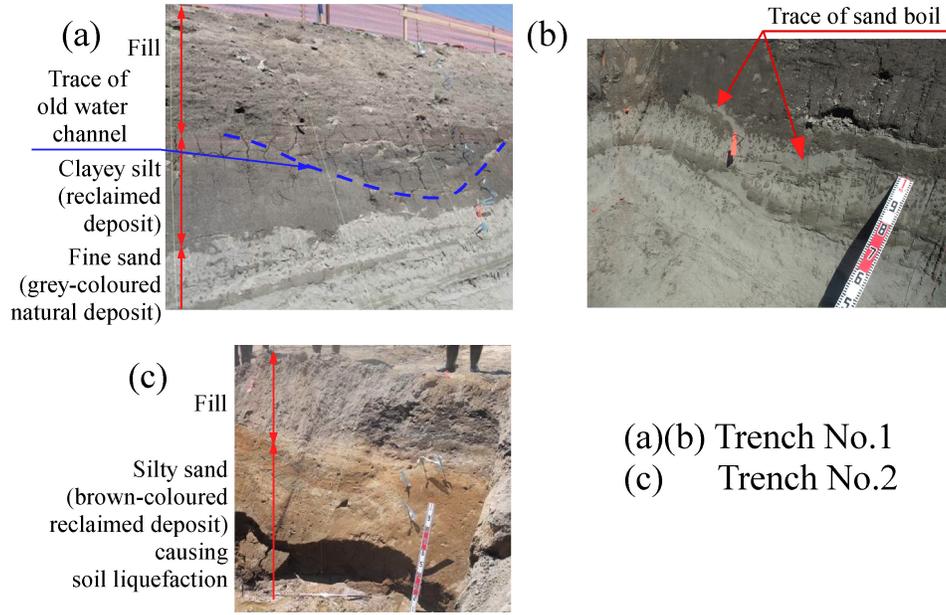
Observation of cross section views of trenches, (a) overall observation at trench No.1, (b) trace of soil liquefaction at trench No.1, (c) observation at trench No.2
